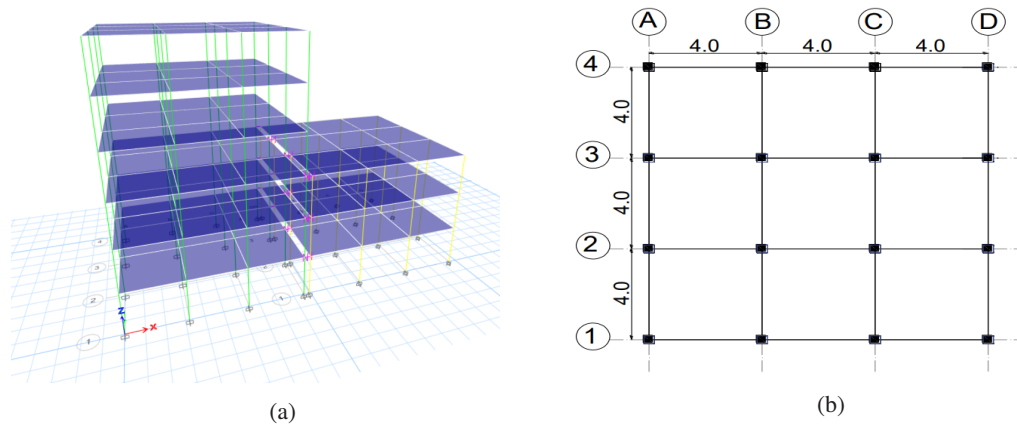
One six storey and one storey building with same floor plan (a) Elevation (b) Plan
